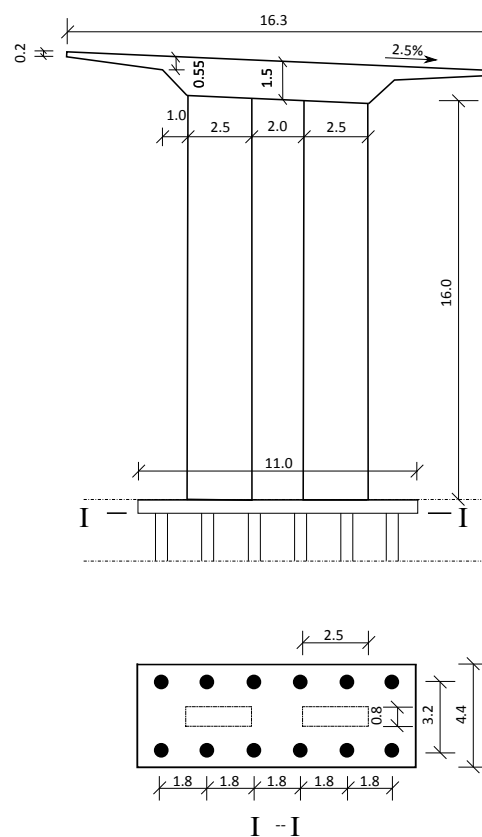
Dimensions [m] of the concrete deck and column at section A-A for K032R (top), pile configurations at sections I-I (below).
